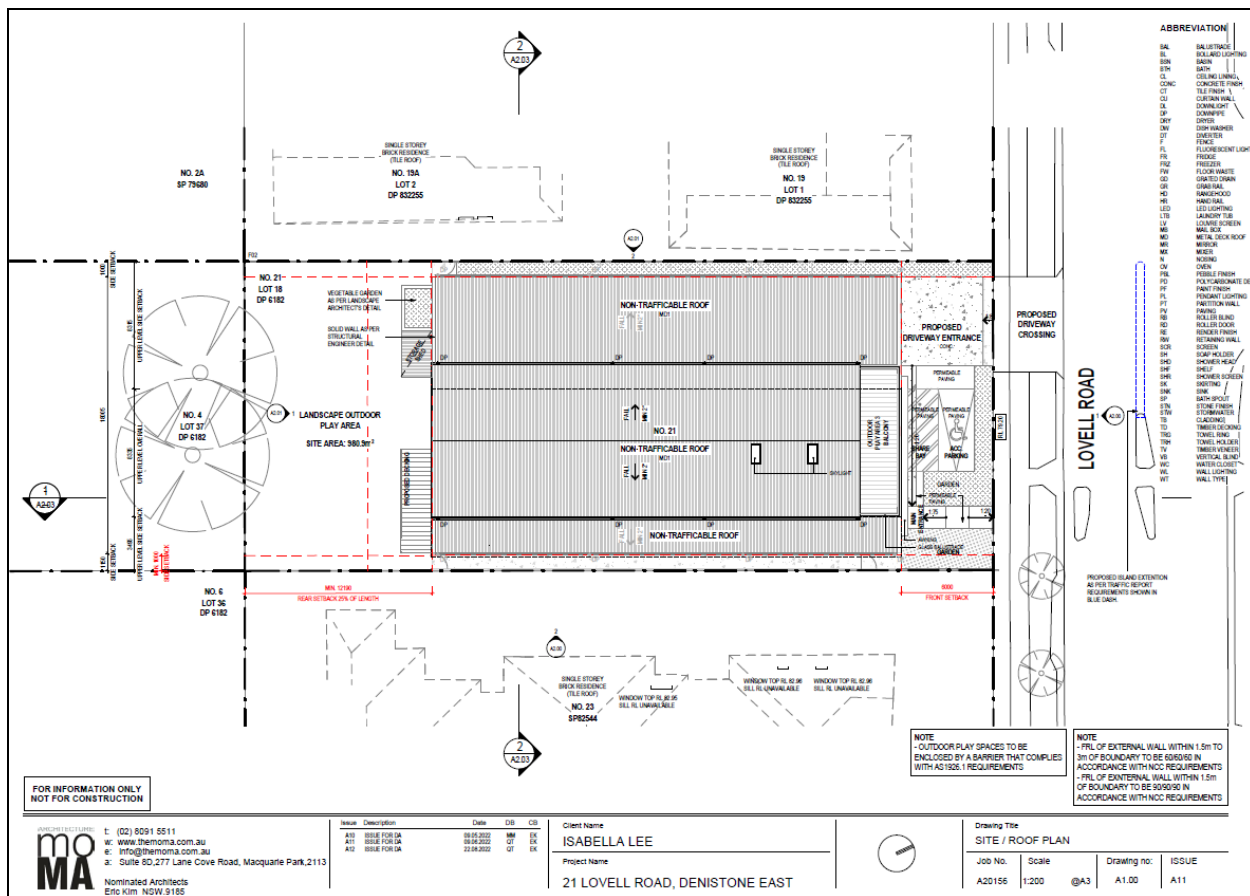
Site plan (source: Plan A1.00 prepared by moMA Architects).
